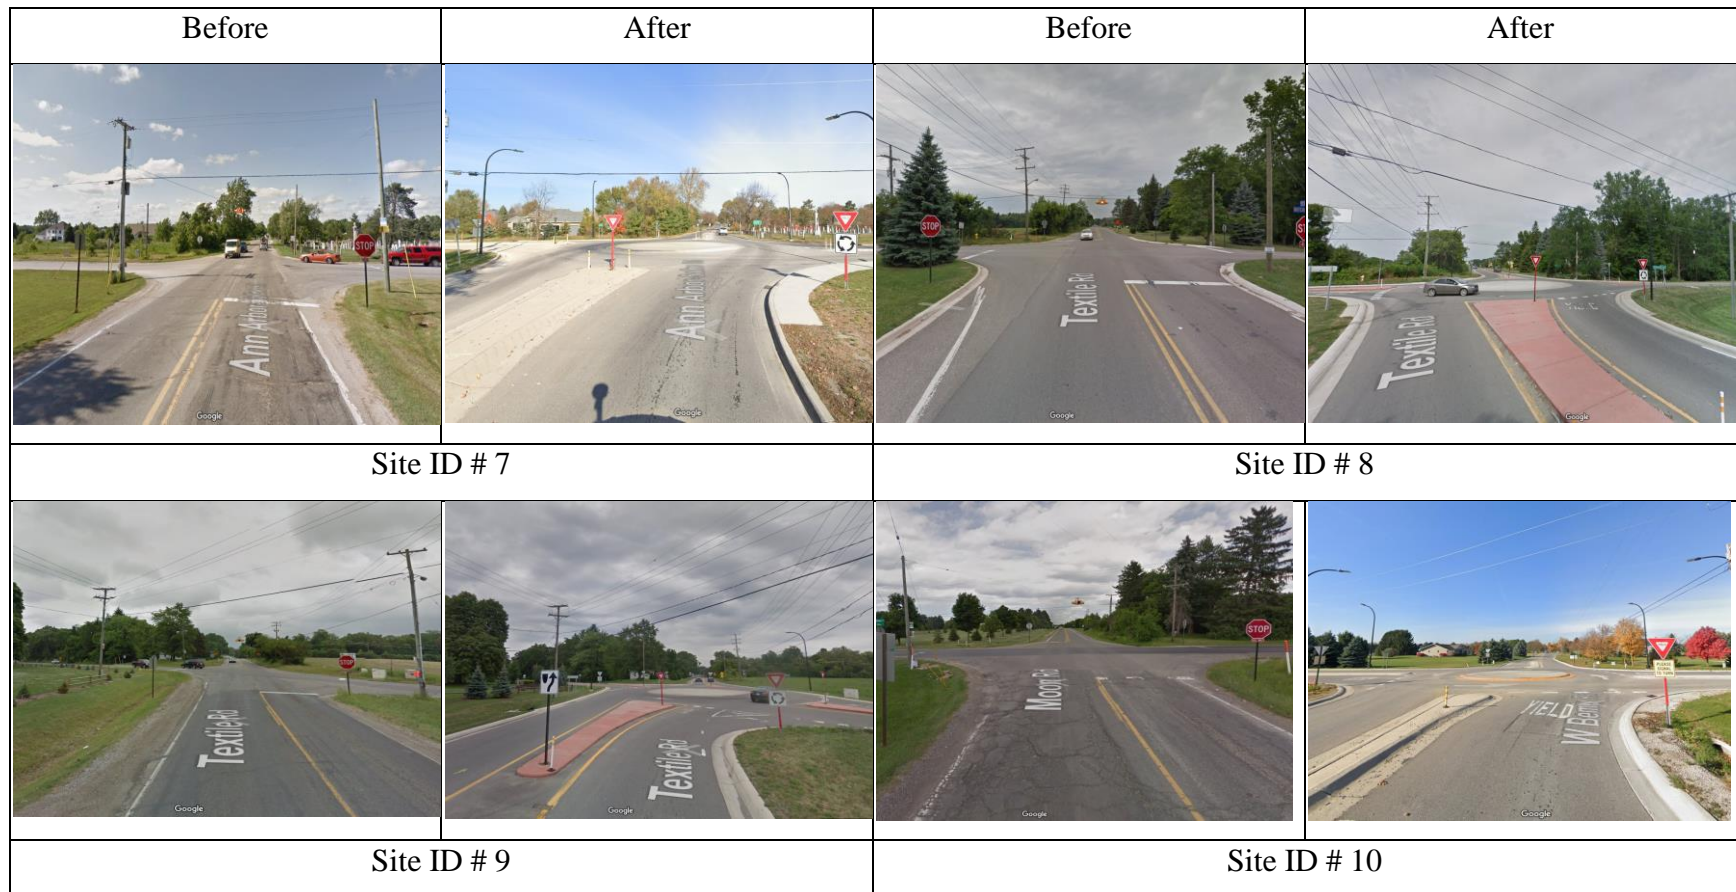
Before and after pictures of OWSC ramp intersections converted to mini-roundabouts (© Google street view).
